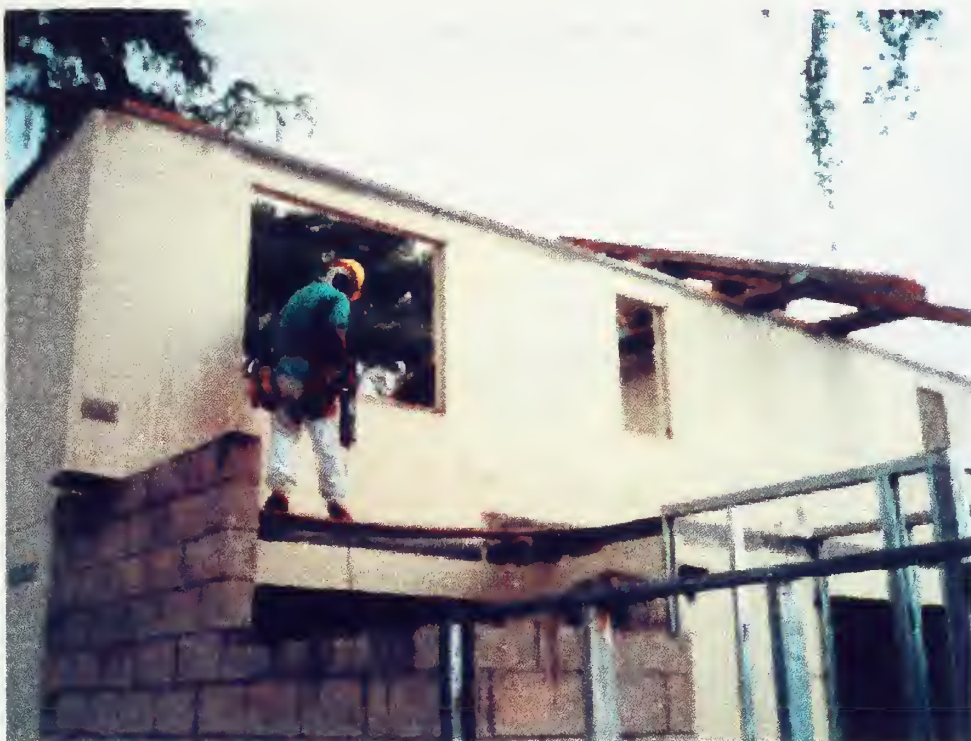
Renovation project, Hickam Air Force Base; fall protection plan (Note improper work platform and lack of fall protection.)
